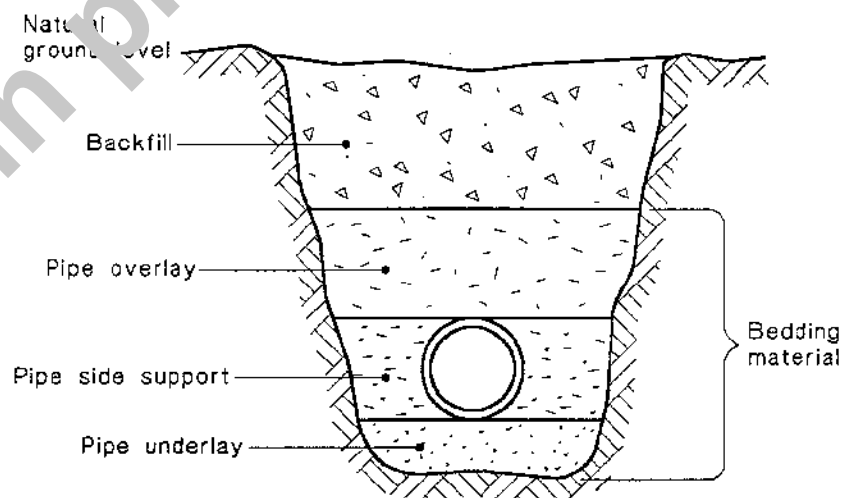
LAYERS IN A TRENCH INSTALLATION
